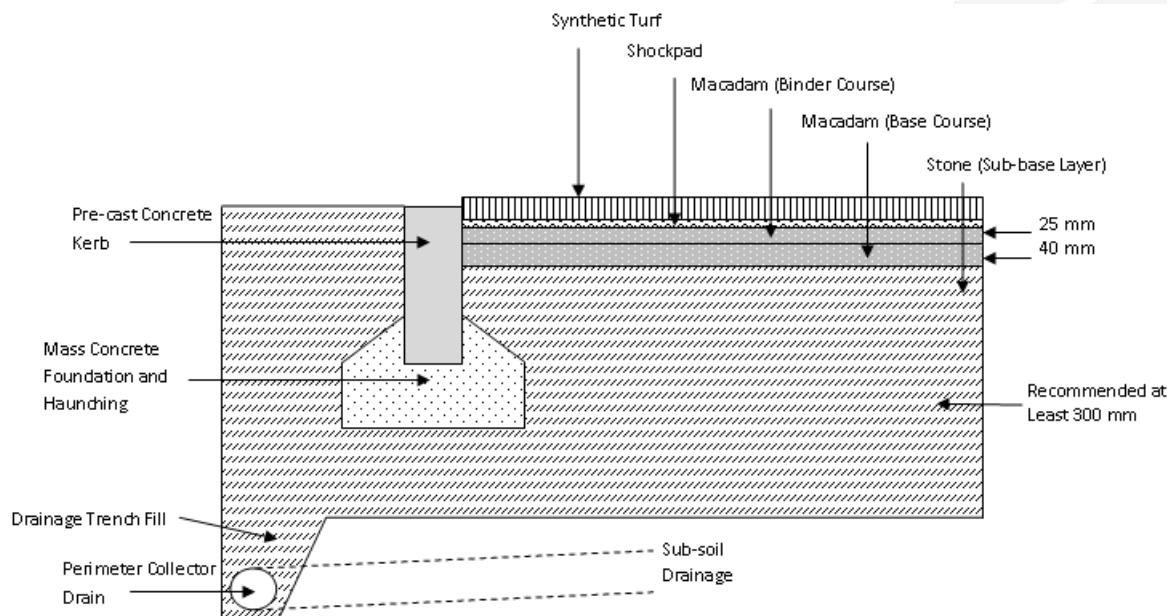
Typical Cross Section of Edge Detail on a Synthetic Turf Pitch on a Bound Base (not to Scale)
